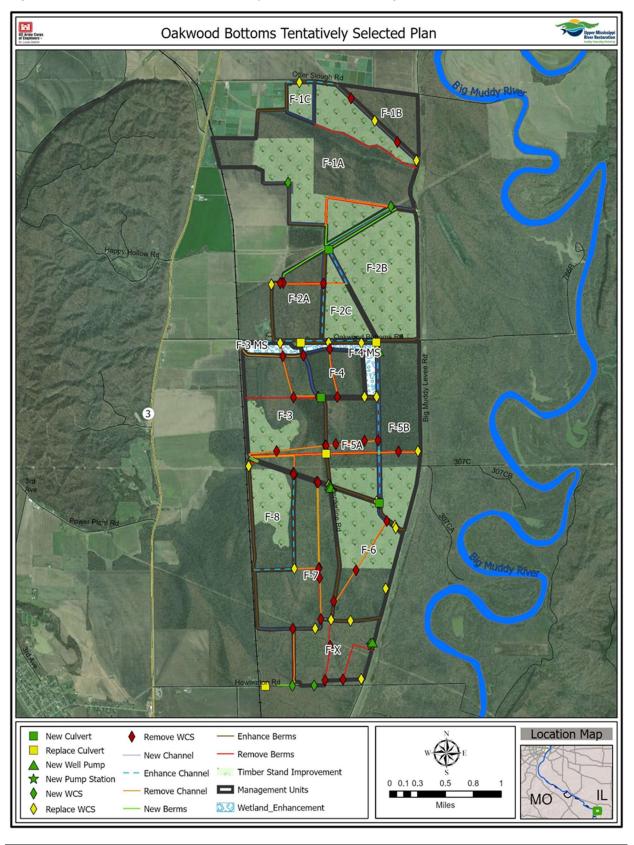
Proposed Plan at Oakwood Bottoms HREP.
